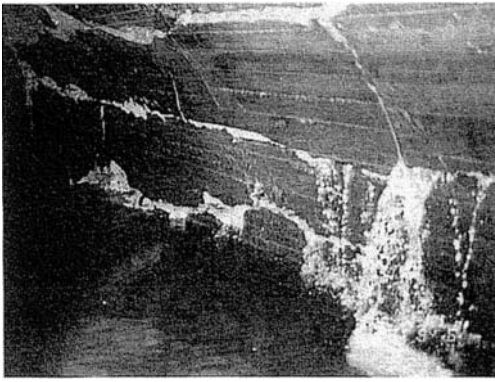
Cracks along Tunnel Axis of Discharged Tunnel
